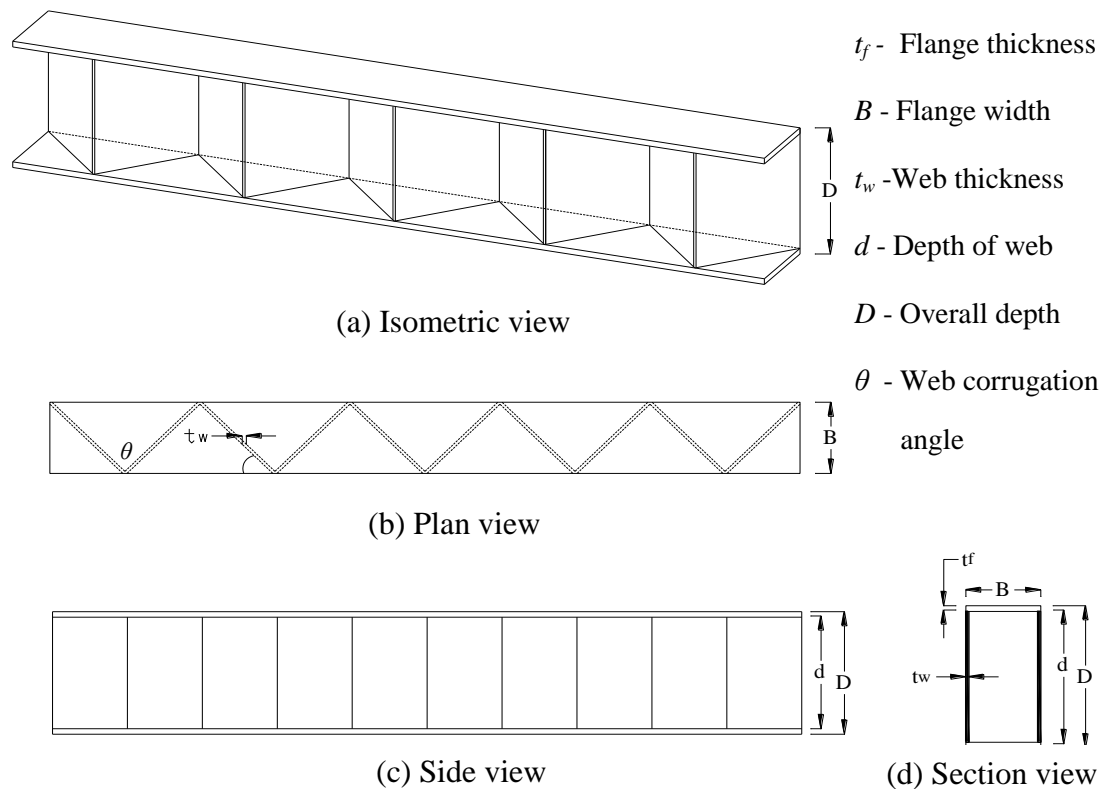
Shape and dimensions of a typical  $T_{RI}WP$  steel section (all units are in mm)
